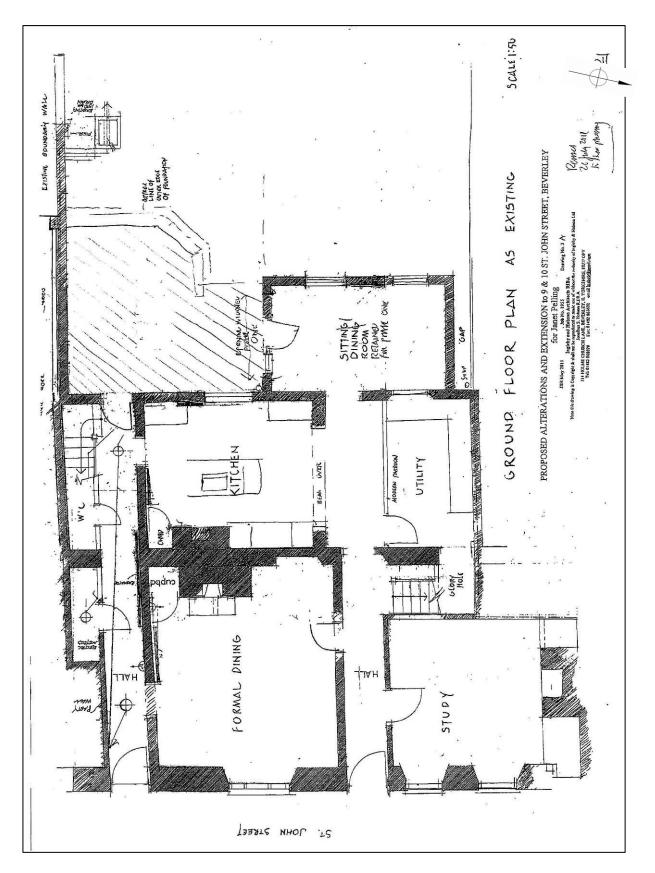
GROUND FLOOR AS EXISTING (not to scale - drawing supplied by Ingleby & Hobson)
